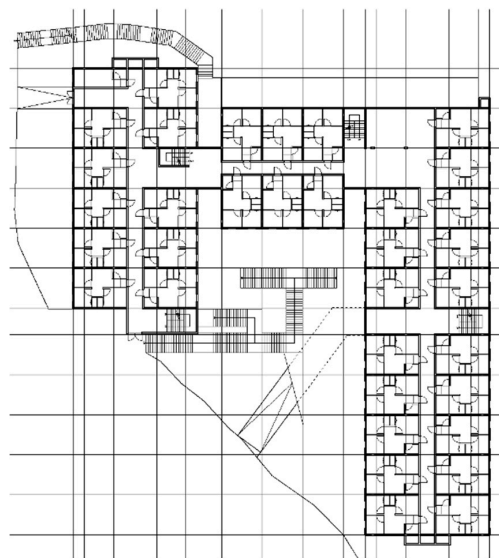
Sixth-floor plan of Hoehyeon Civic Apartment [64–66] (redrawn by: author).
